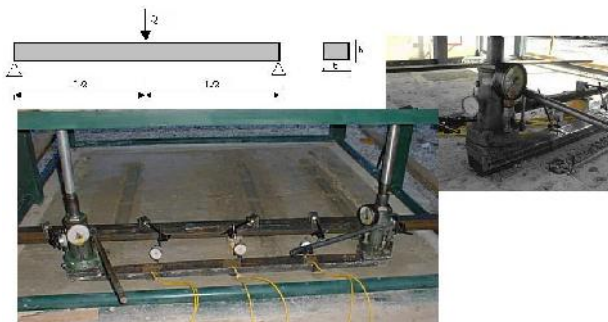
Primary girder: a) testing the girder on two supports with concentrated force, b) girder load detail, c) detail of girder being tested
